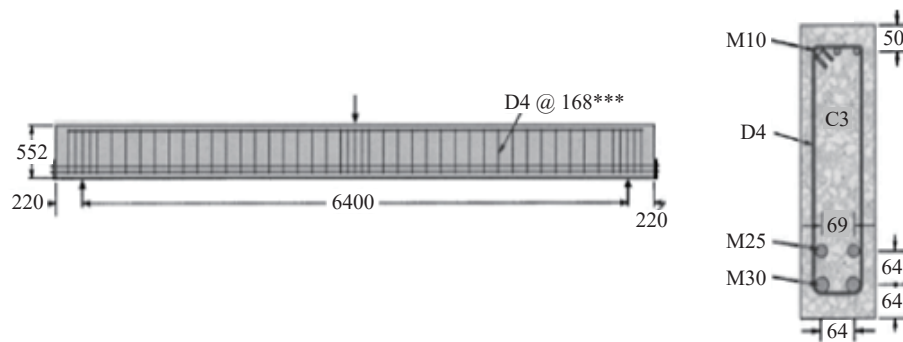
Structural diagram of VS-C3 beam (unit: mm)
